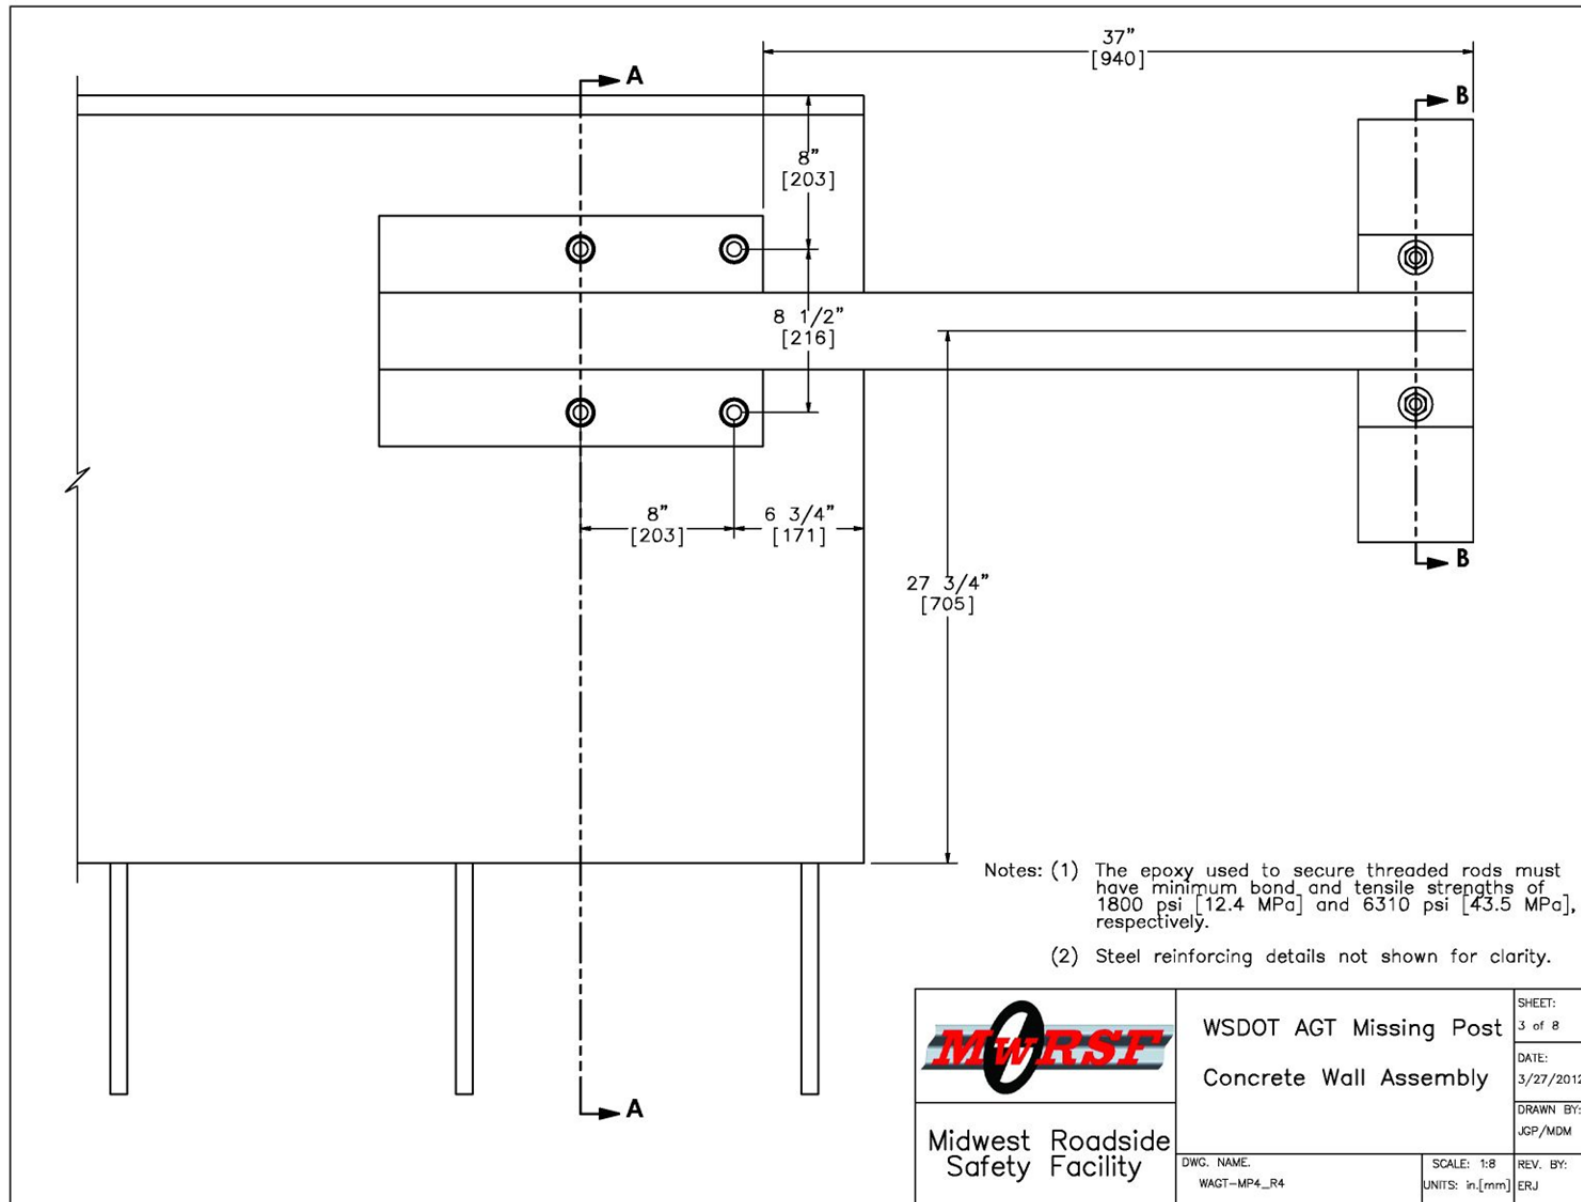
WAGTMP Bogie Testing Concrete Wall Assembly – Back View
